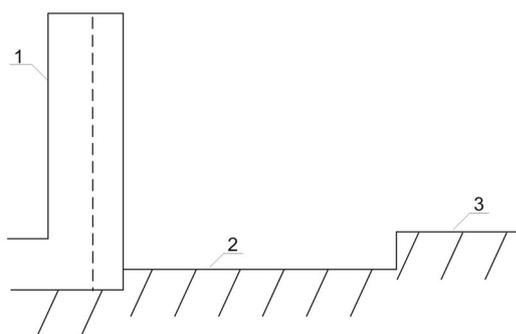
Fishing pit (Andreji, 1996 – edited): 1 – outlet facility, 2 – fishing pit, 3 – main drainage ditch
